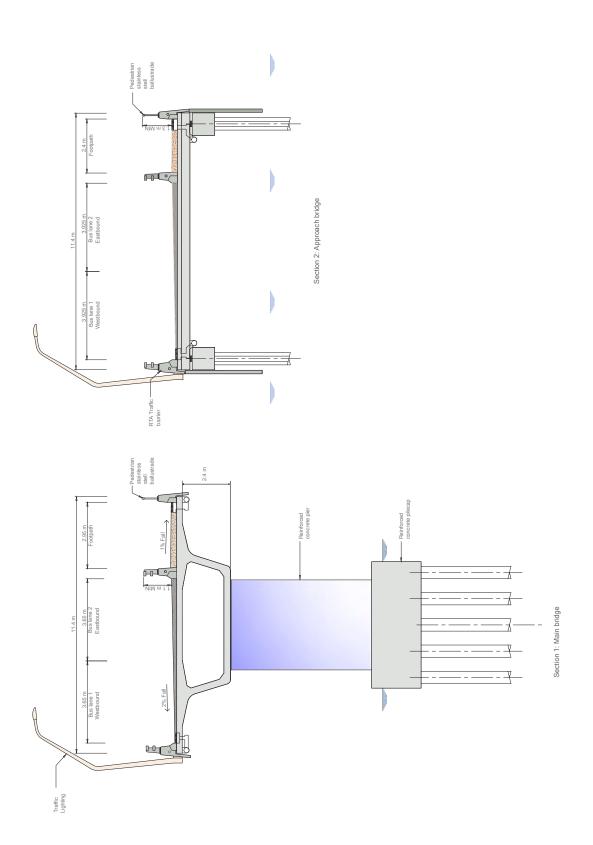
Proposed Homebush Bay Bridge in cross-section looking west
